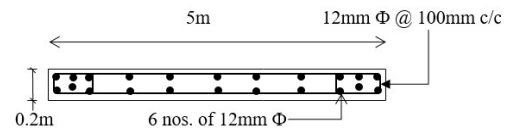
Reinforcement details of wall specimen analysed with different web reinforcement ratios
